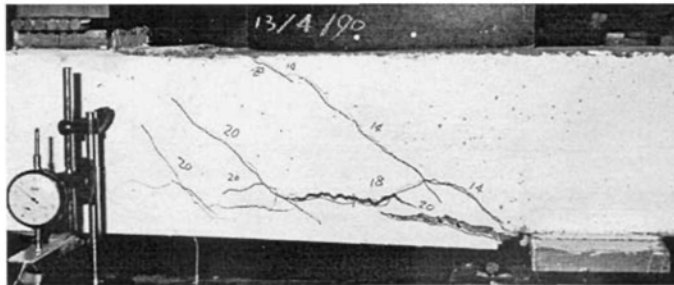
'plate-end shear failure' of beam without stirrups (CDC debonding)
